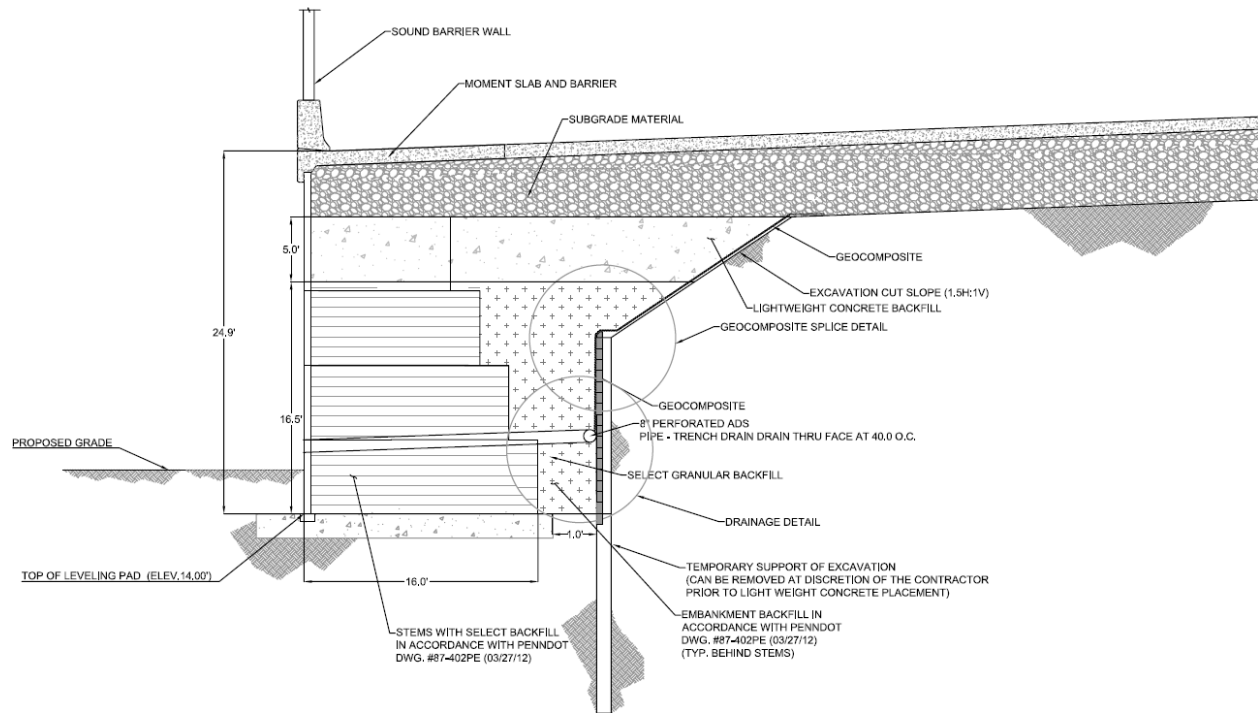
Typical cross section for Wall 9 (S-32707).
